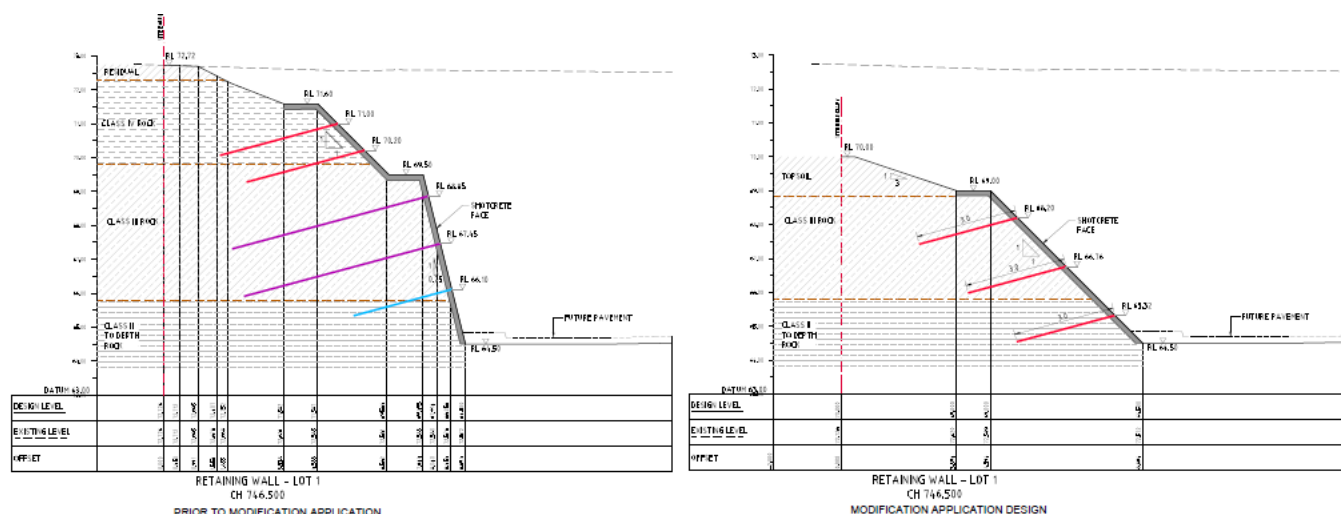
Comparison of approved and modified northern boundary retaining wall sections for Lot 1
